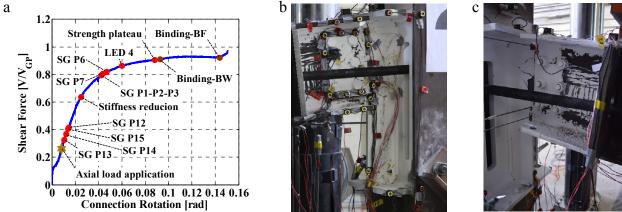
Specimen BG3-2-13-F-200C: (a) damage propagation, (b and c) deformed shape at strength plataeu
